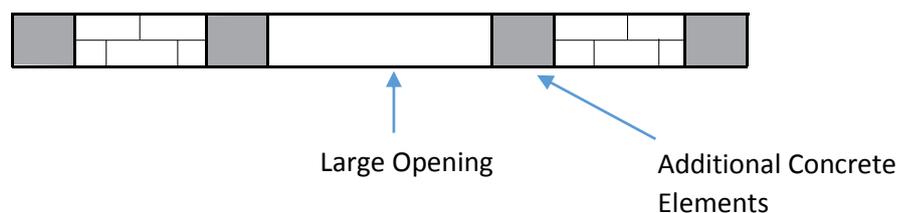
Plan view: Concrete elements added to masonry walls to accommodate large openings for commercial purposes on the ground floor of buildings (not to scale).
